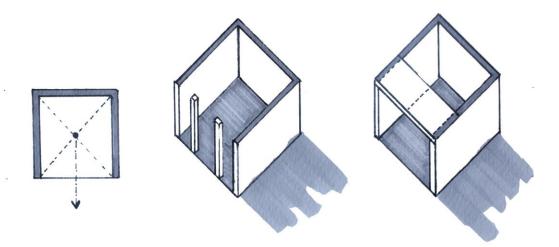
U-shaped elements defining space adapted from Ching, (2007)
